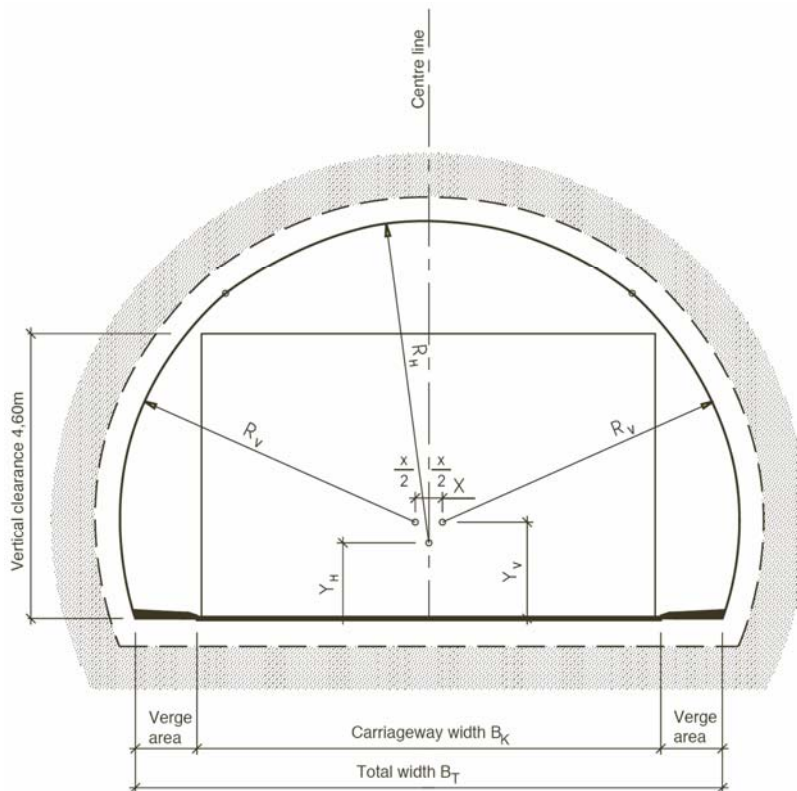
Dimension parameters of Norwegian road tunnel profiles T9.5 to T12.5.
